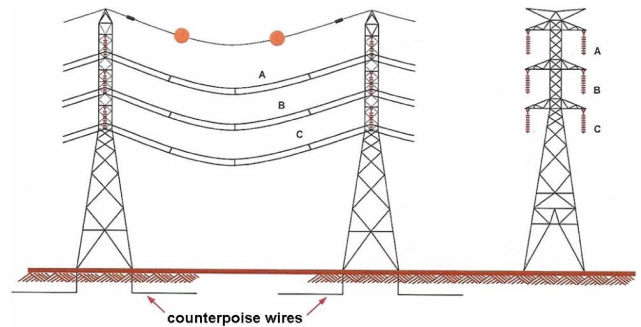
Transmission tower, aerial cables, tower-footing, and counterpoise wires.
